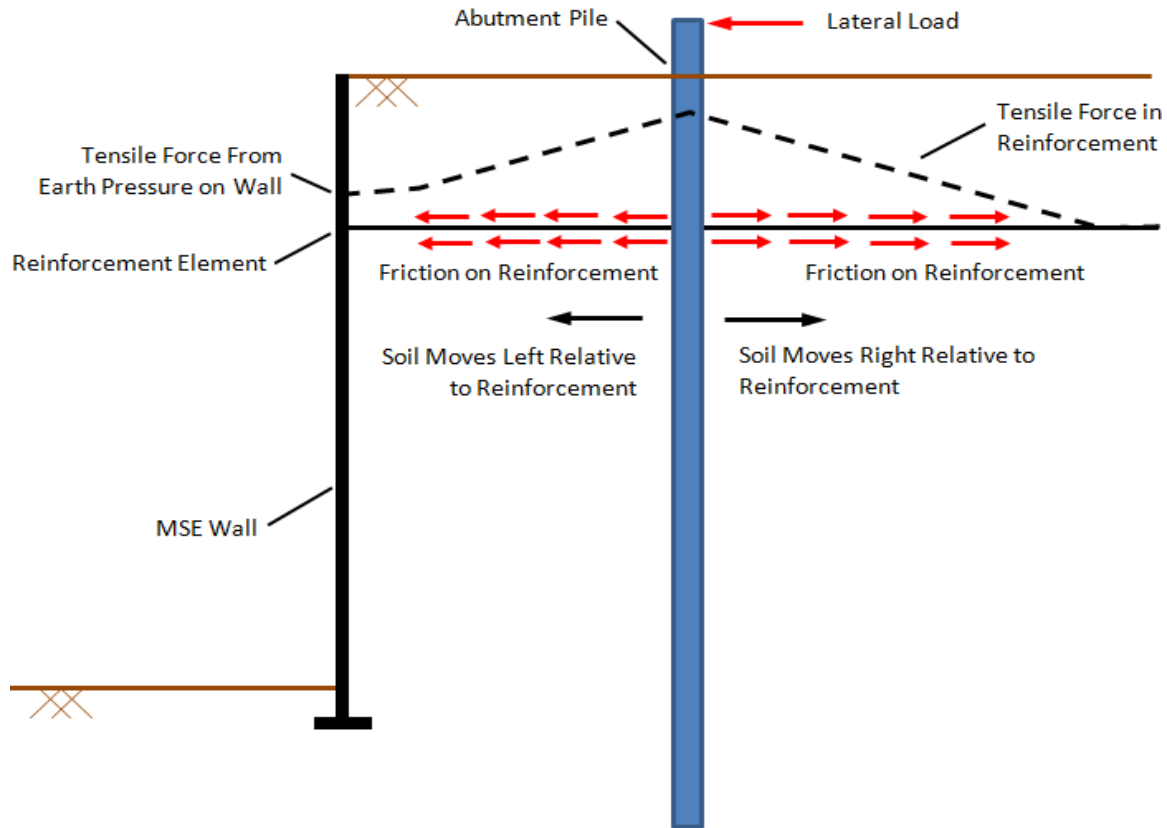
Interaction of soil and MSE wall reinforcement when pile is laterally loaded.
